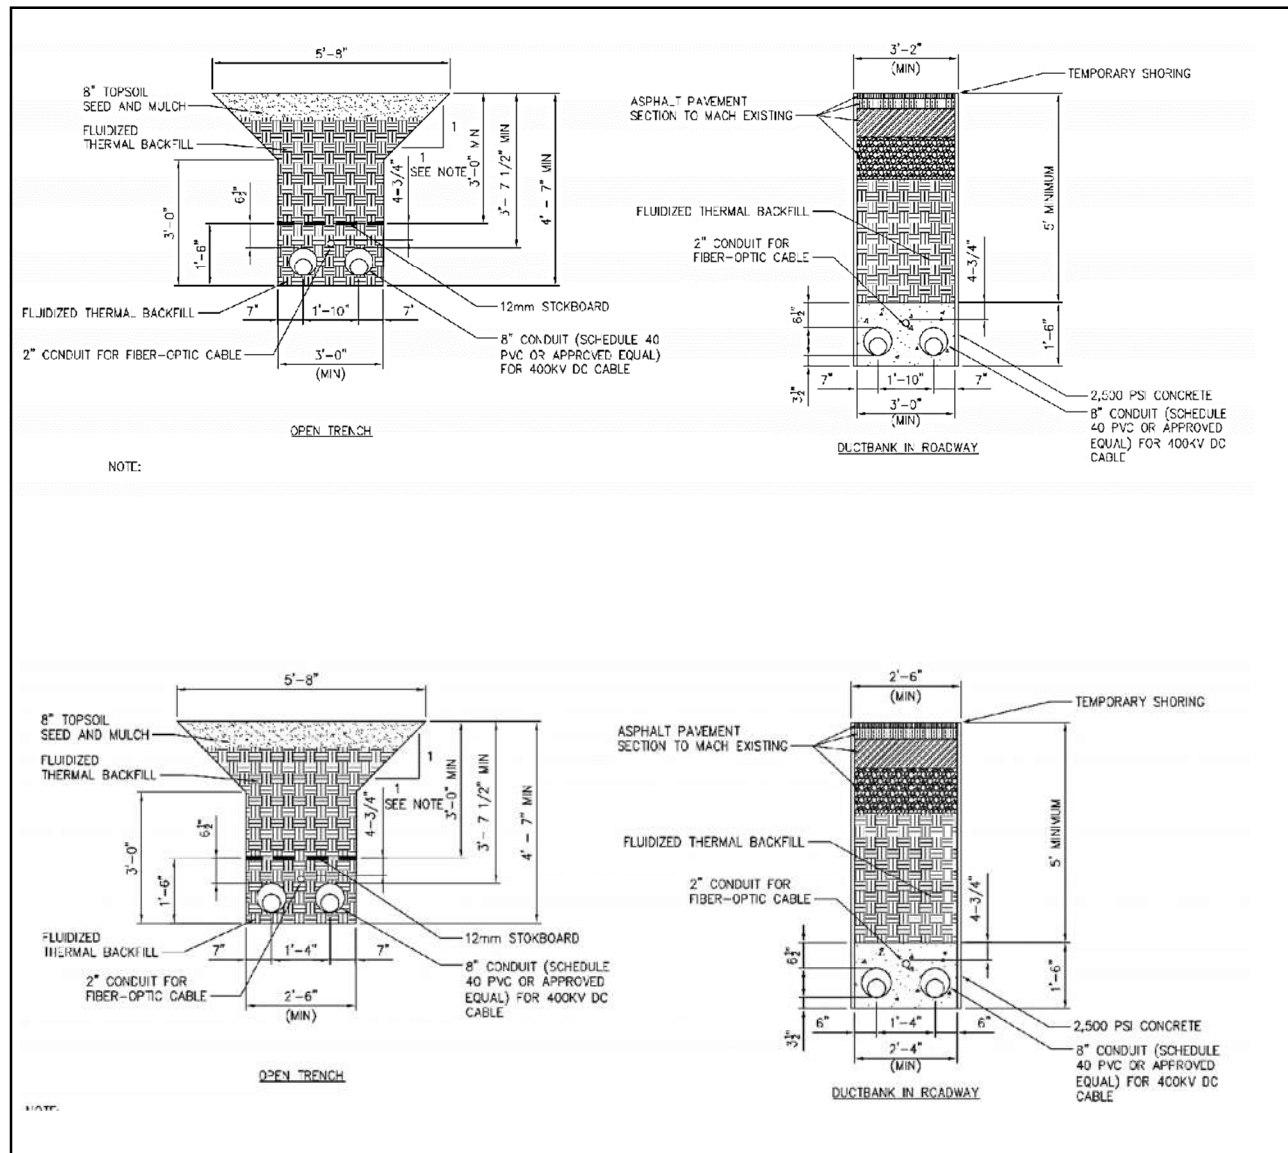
Typical open trench and duct bank (roadway) installation of the cable in the Dresden to Whitehall portion of the Project, or Segment 2. Upper drawings are 36-inch-wide excavations; lower drawings are 30-inch-wide excavations.
